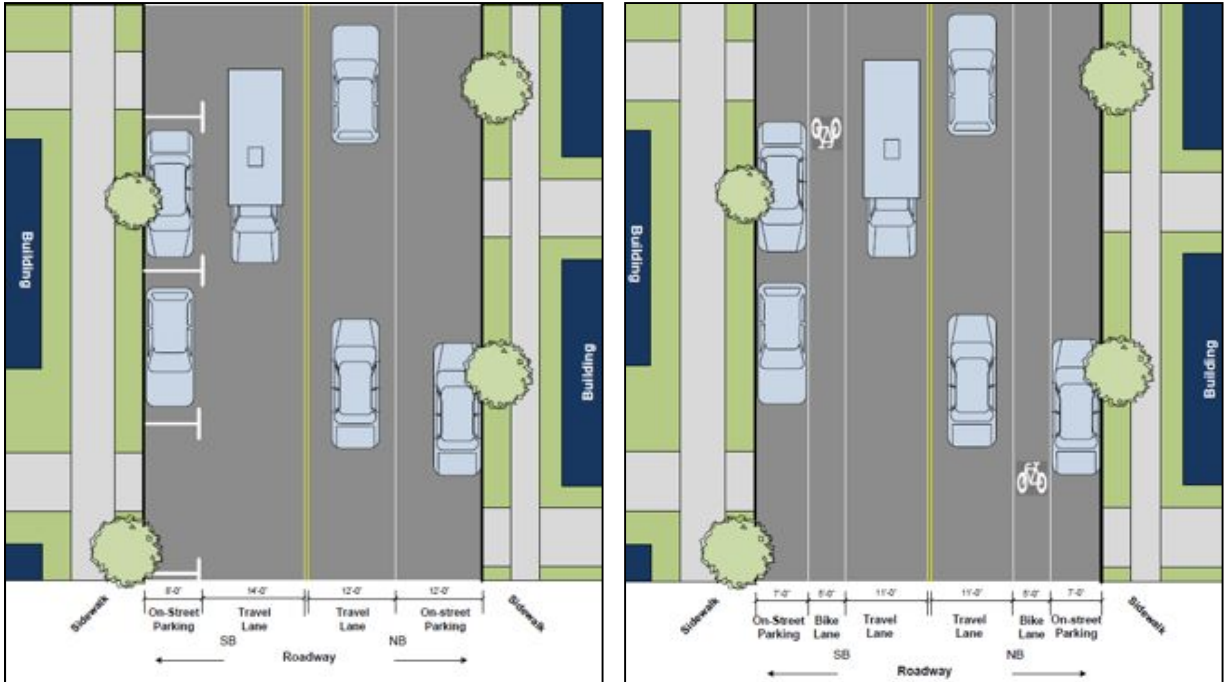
Example of Existing Conditions and Proposed Road Reallocation–
